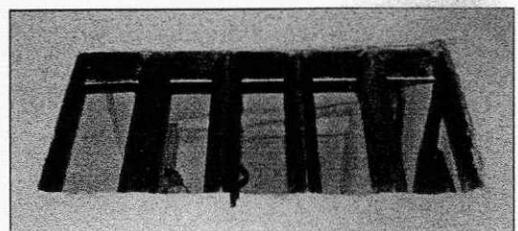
(left): First floor landing of stair tower, showing store and window onto stair lobby
